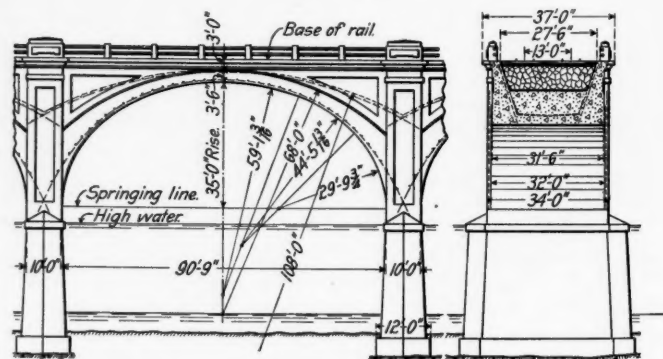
Elevation and Section of 90 ft. 9 in. Arch of Bridge.
